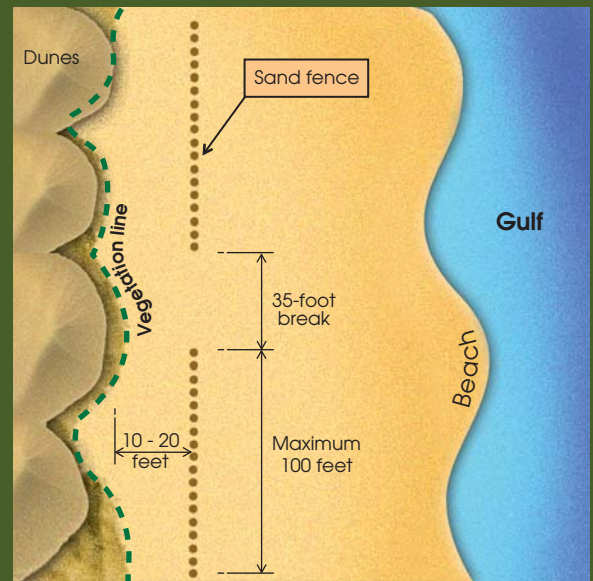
Placement of dune-building structures for repairing damaged foredunes.
